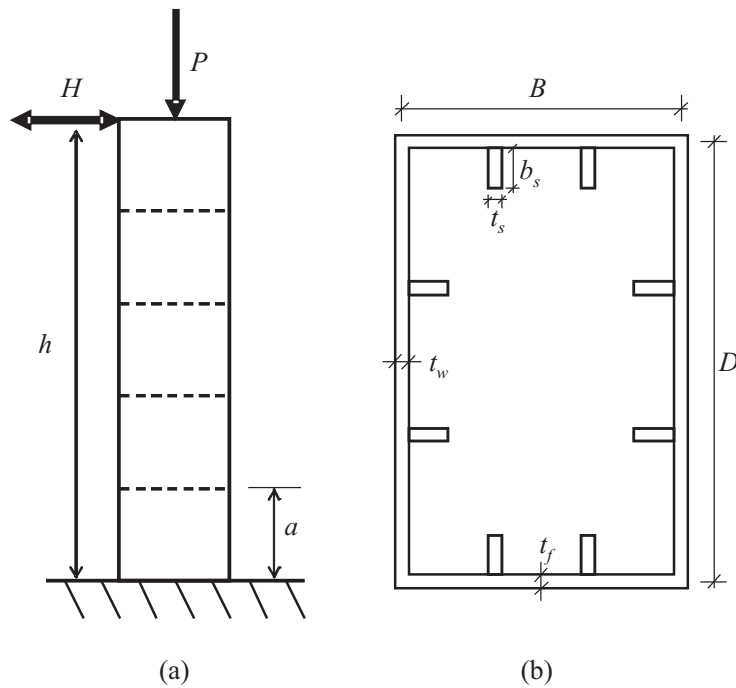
Typical Japanese bridge pier specimens: (a) cantilever column, (b) stiffened hollow box cross-section
